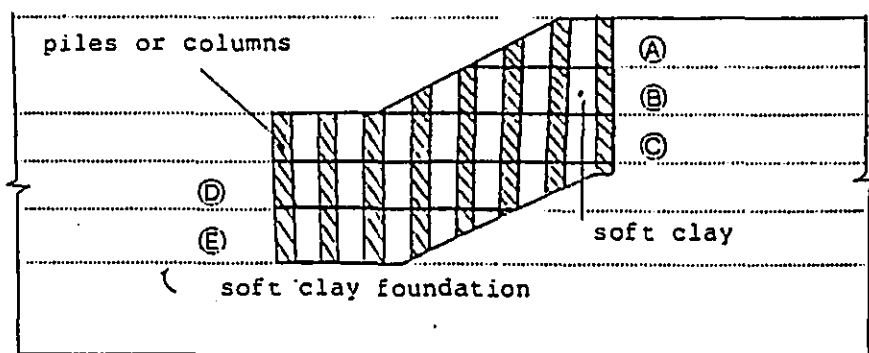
Excavated slope improved by sand compaction piles or cement columns
